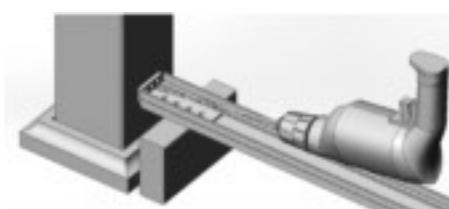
ALUMINUM STIFFENER RESTING ON 2X4 BLOCK
